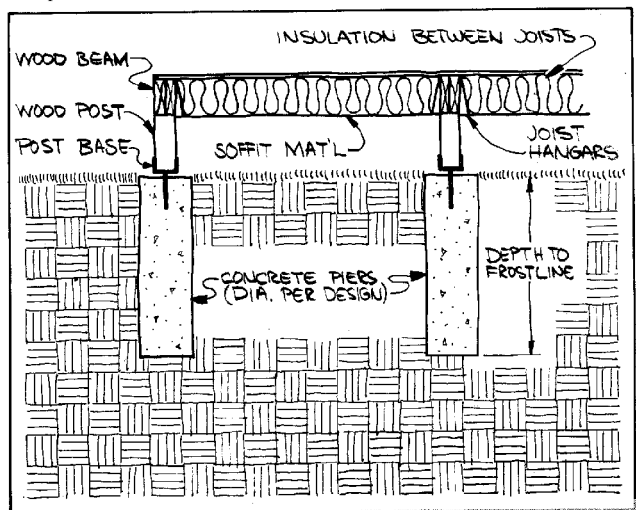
Pier foundation. This simple alternative requires no forming, no waterproofing, and minimal engineering. Above-grade posts can be wood or masonry, and the openings between piers can be infilled with lattice work or solid material.
